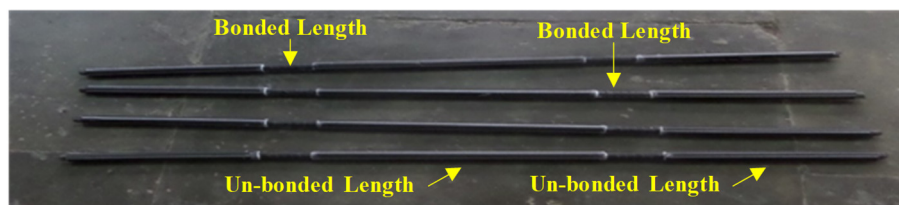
Bonded and un-bonded regions of steel bar using PVC pipes
